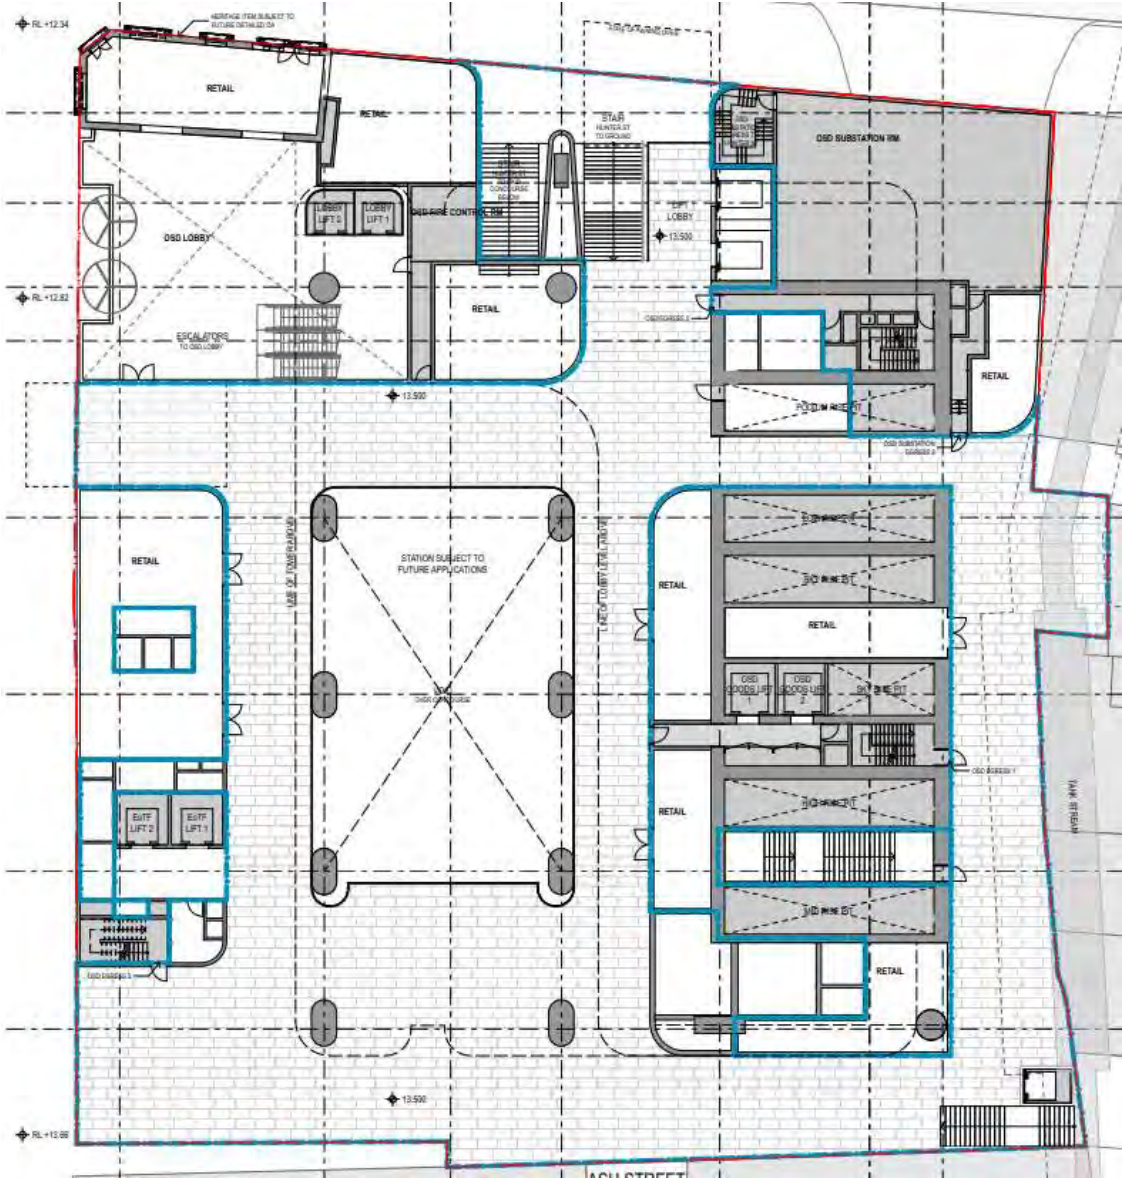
West Hunter Street Station and OSD ingress locations at George Street
